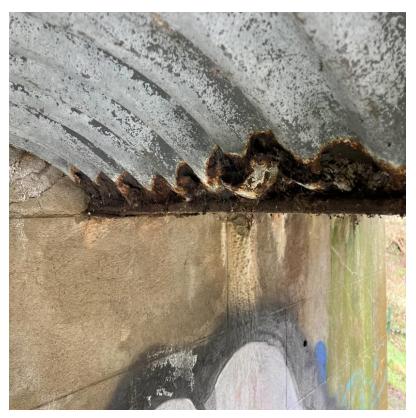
Surface rust, delamination and corrosion to the corrugated steel shuttering forming the soffit of the structure. Predominant in arches between PB1 - PB2 and PB6 - PB7.
